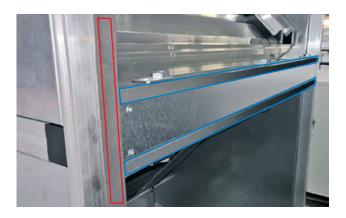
For sections with a steel profile (e.g. plate heat exchanger or rotary wheel section), additional EPDM rubber sealing tape with a 15 x 5 mm cross-section is used, see also blue marked tape.
